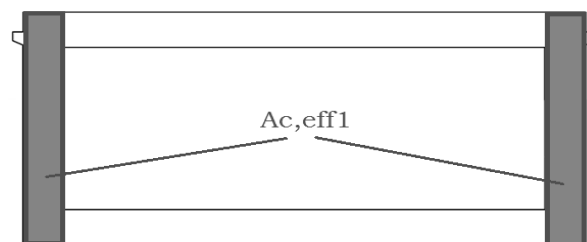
Effective concrete area to take up the vertical forces in the walls
